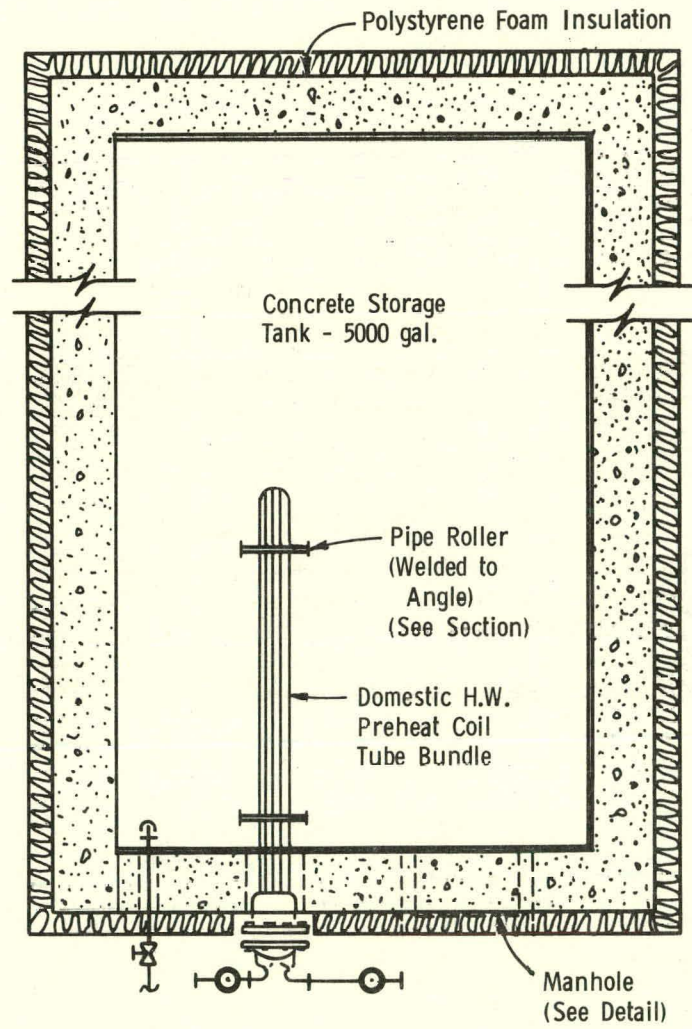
Plan View of a Rectangular Concrete Tank (not to scale)
